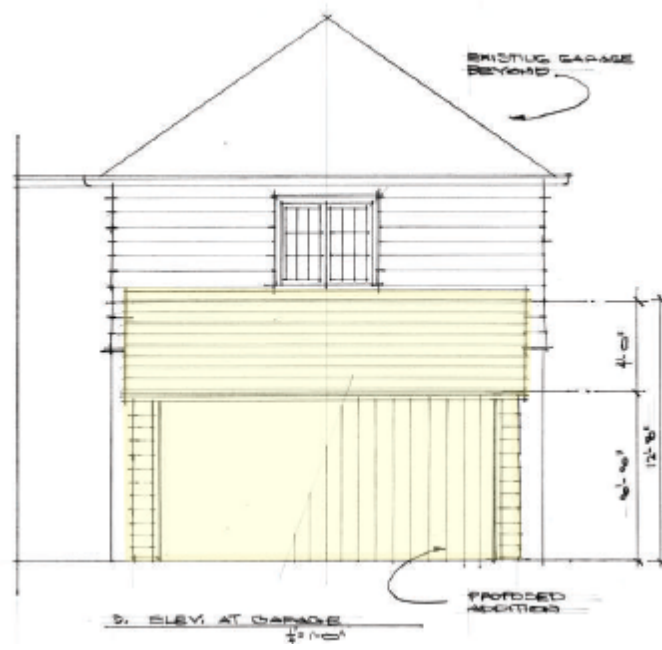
Proposed Front Elevation (East) of Attached Garage Addition
